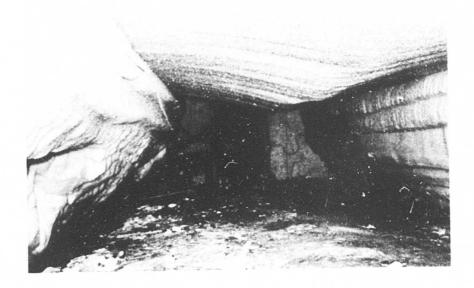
Stairs leading to escape hatch at rear of Trench 10.
